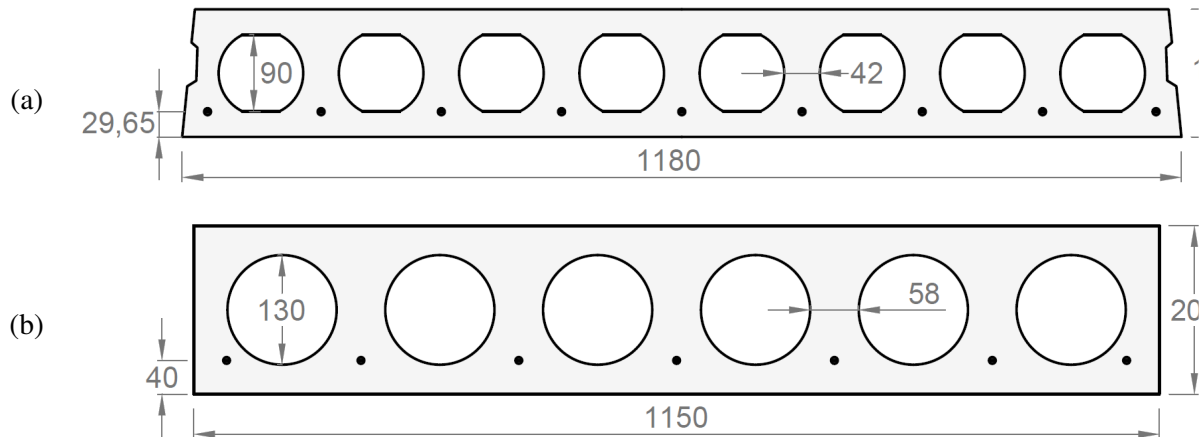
Hollow core slab sections; a) HC150; b) HC200 (Walraven & Merckx, 1983)
